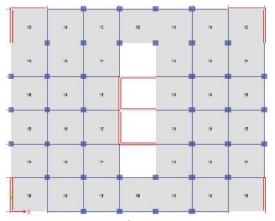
Plan of Building at 19<sup>th</sup> Floor level (LL = 18 kN/sqm)
